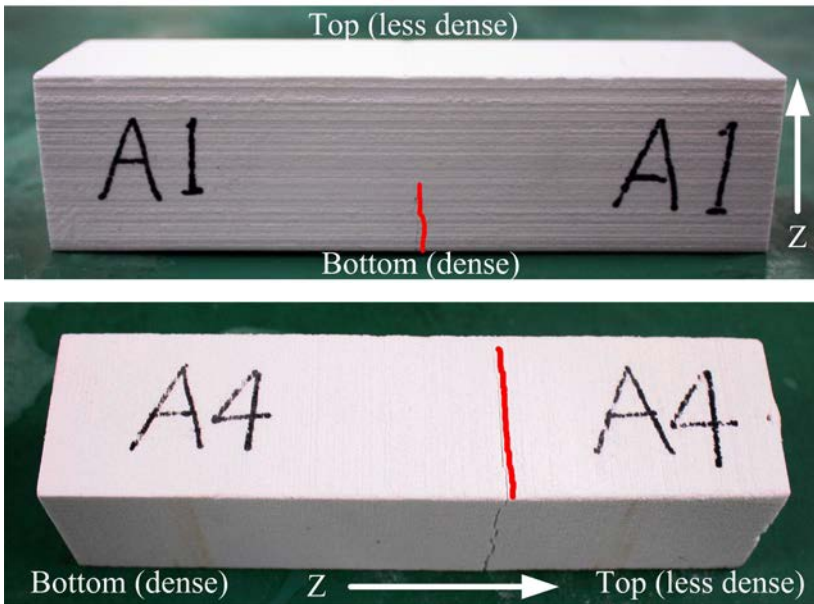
Flexural failure of specimens when (a) loaded in Z direction and (b) loaded in X direction
